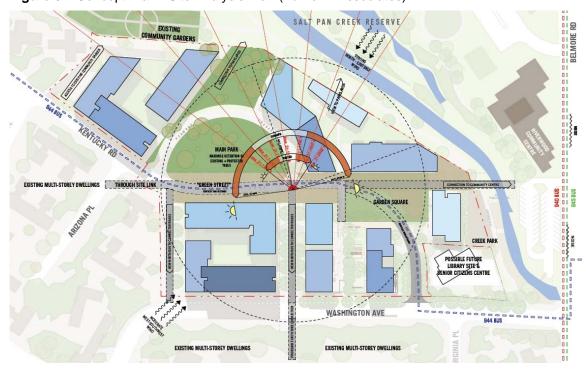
Concept Plan - Site Analysis Plan (Turner + Associates)
